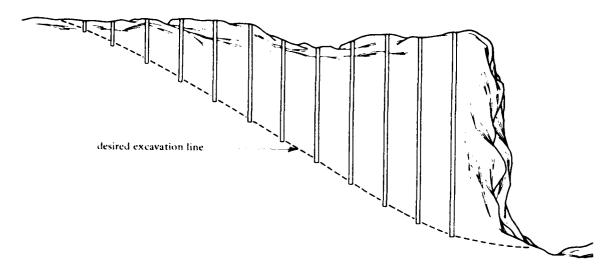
Ramp shot using drilled holes with constant spacing and burden.
